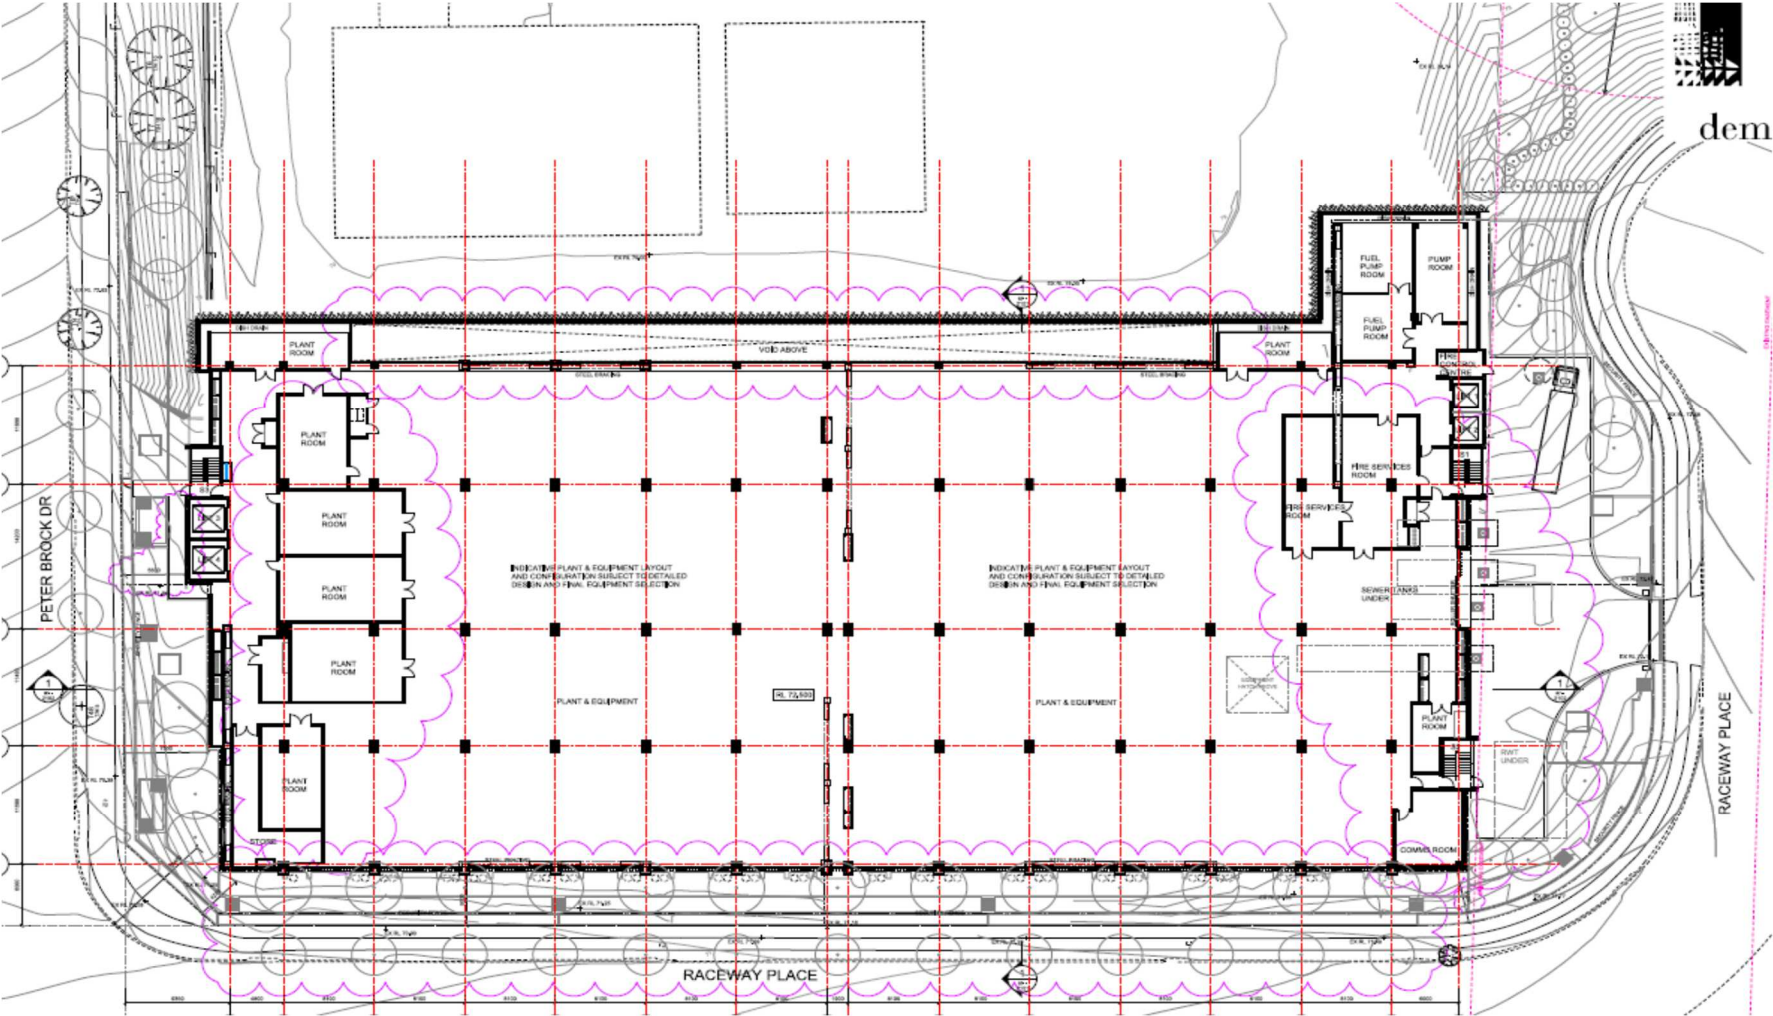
Upper Ground Floor Plan of the DCI SYD02 Data Centre.
